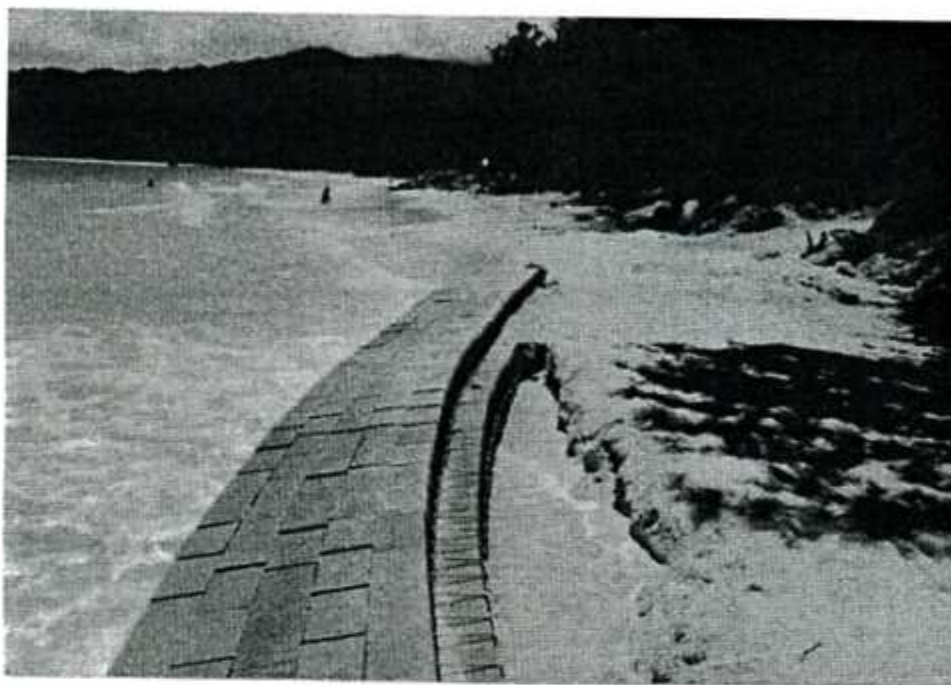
Trench working its way south landward of structure, Bellows Beach, Hawaii, 5 September 1979.
